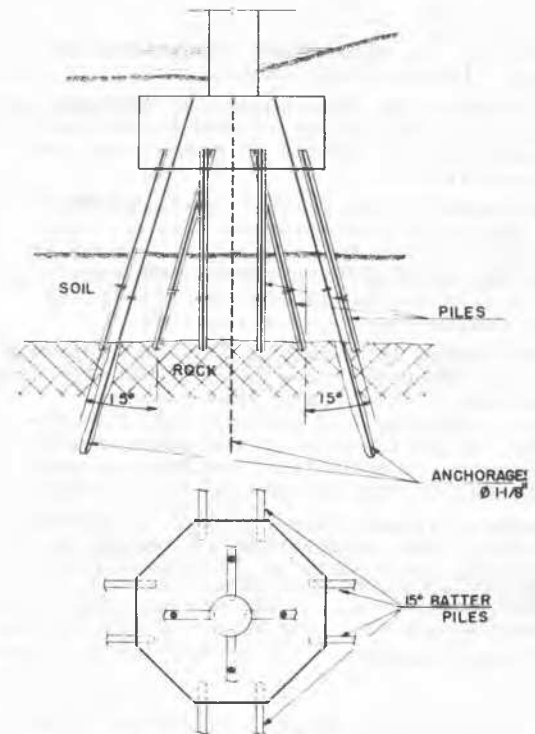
IPITANGA BRIDGE - BAHIA - FOUNDATION ON PILES AND OUTSIDE ANCHORAGE
